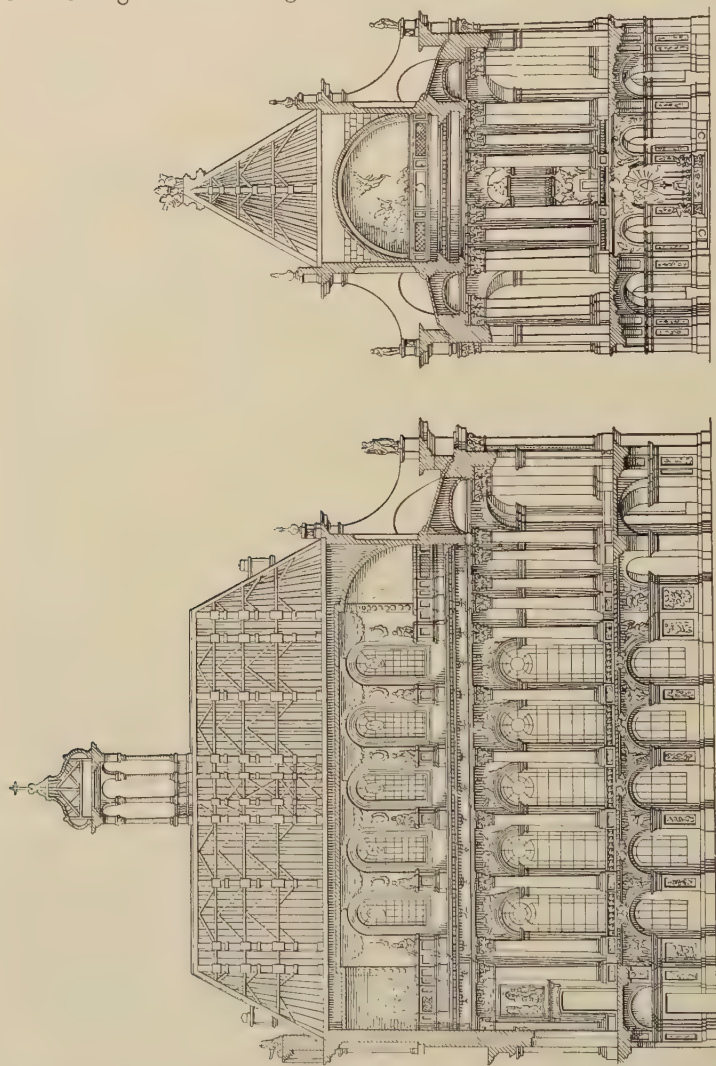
TRANSVERSE AND LONGITUDINAL SECTIONS OF CHAPEL, VERSAILLES
